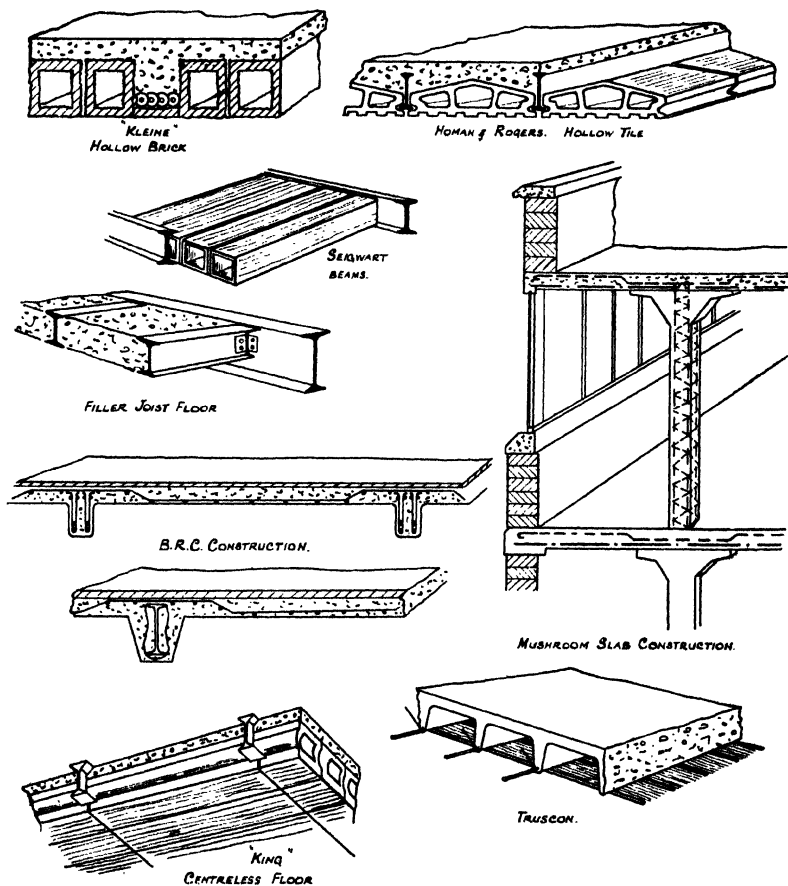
TYPES OF FLOOR CONSTRUCTION
